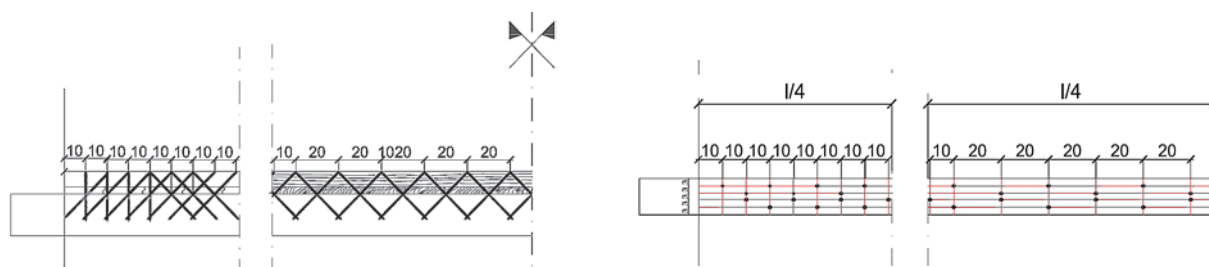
Plan and section of the composite structure and geometry of the connections system
